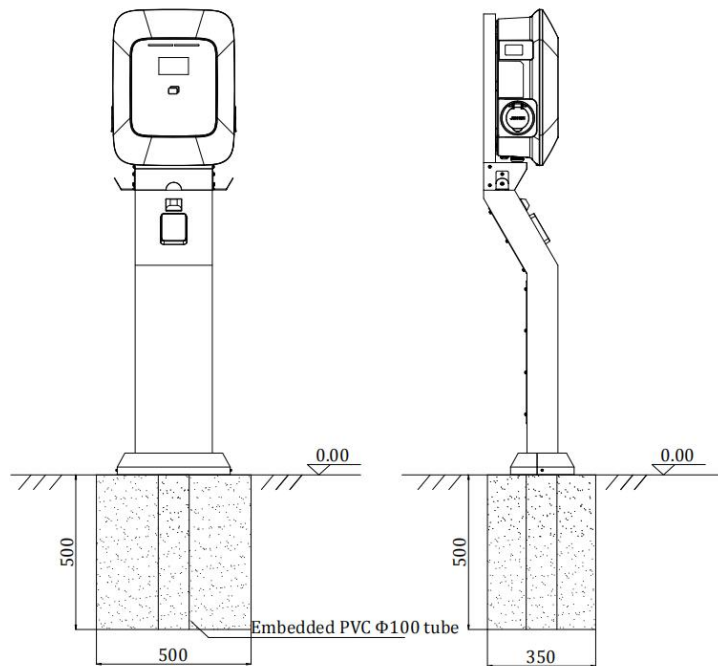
Front view and left view of the concrete foundation (Pole A)
